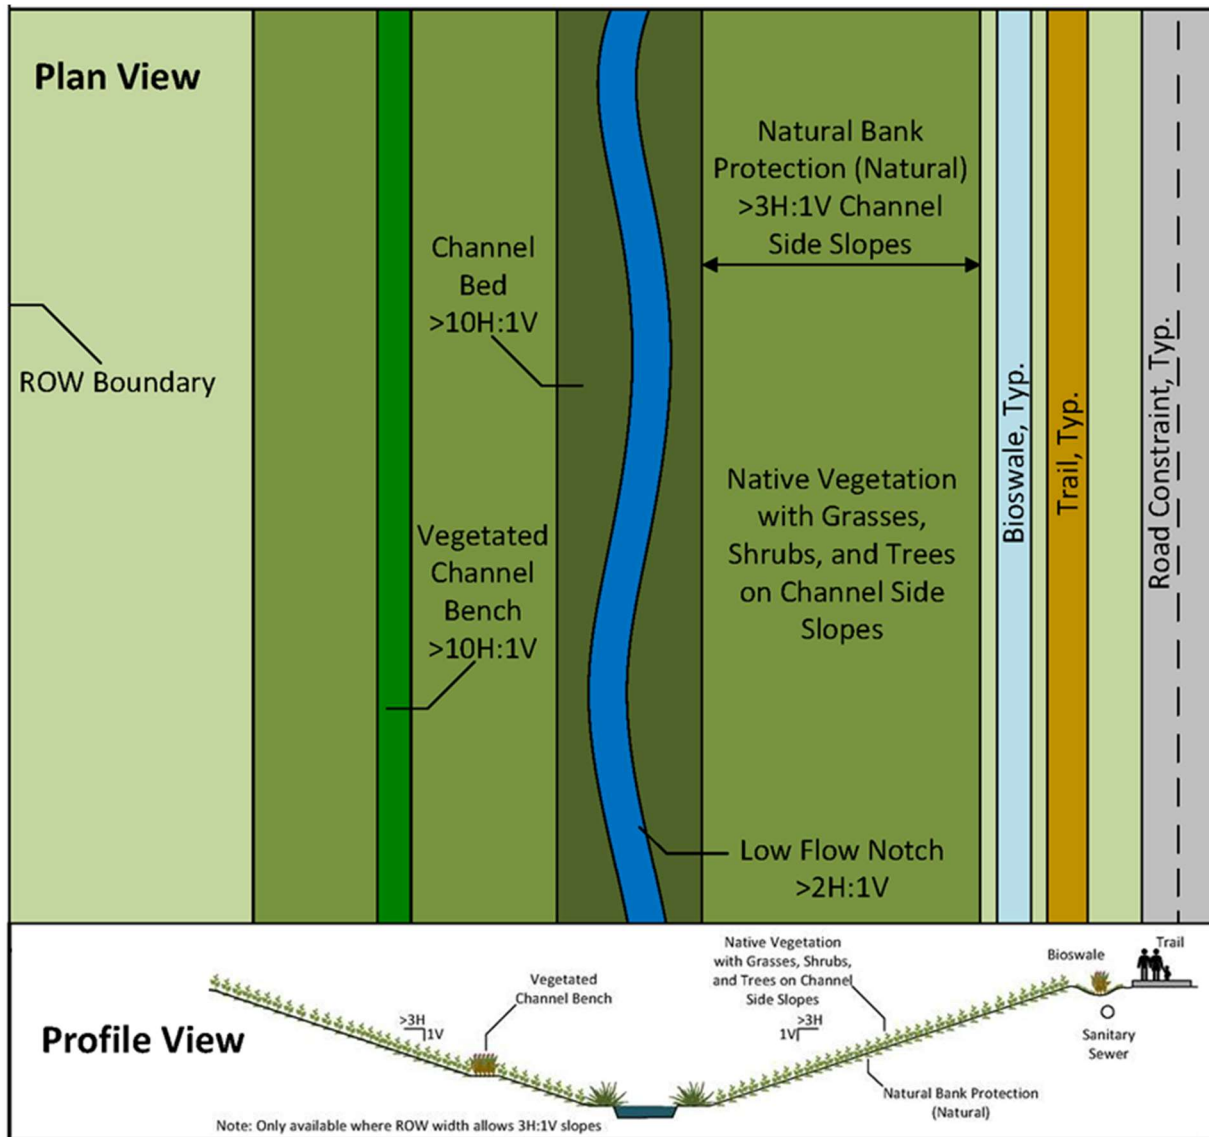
Example Cross Section and Plan View of a Restored Joe's Creek Channel
